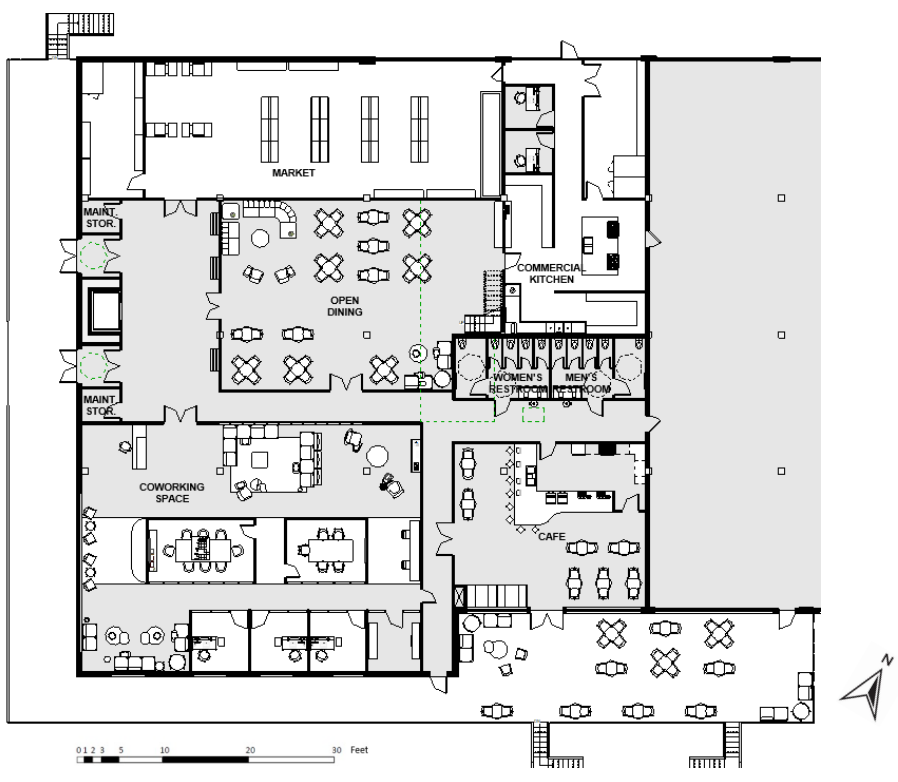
Proposed Overall Floor Plan with North Arrow (Wood, 2023)
